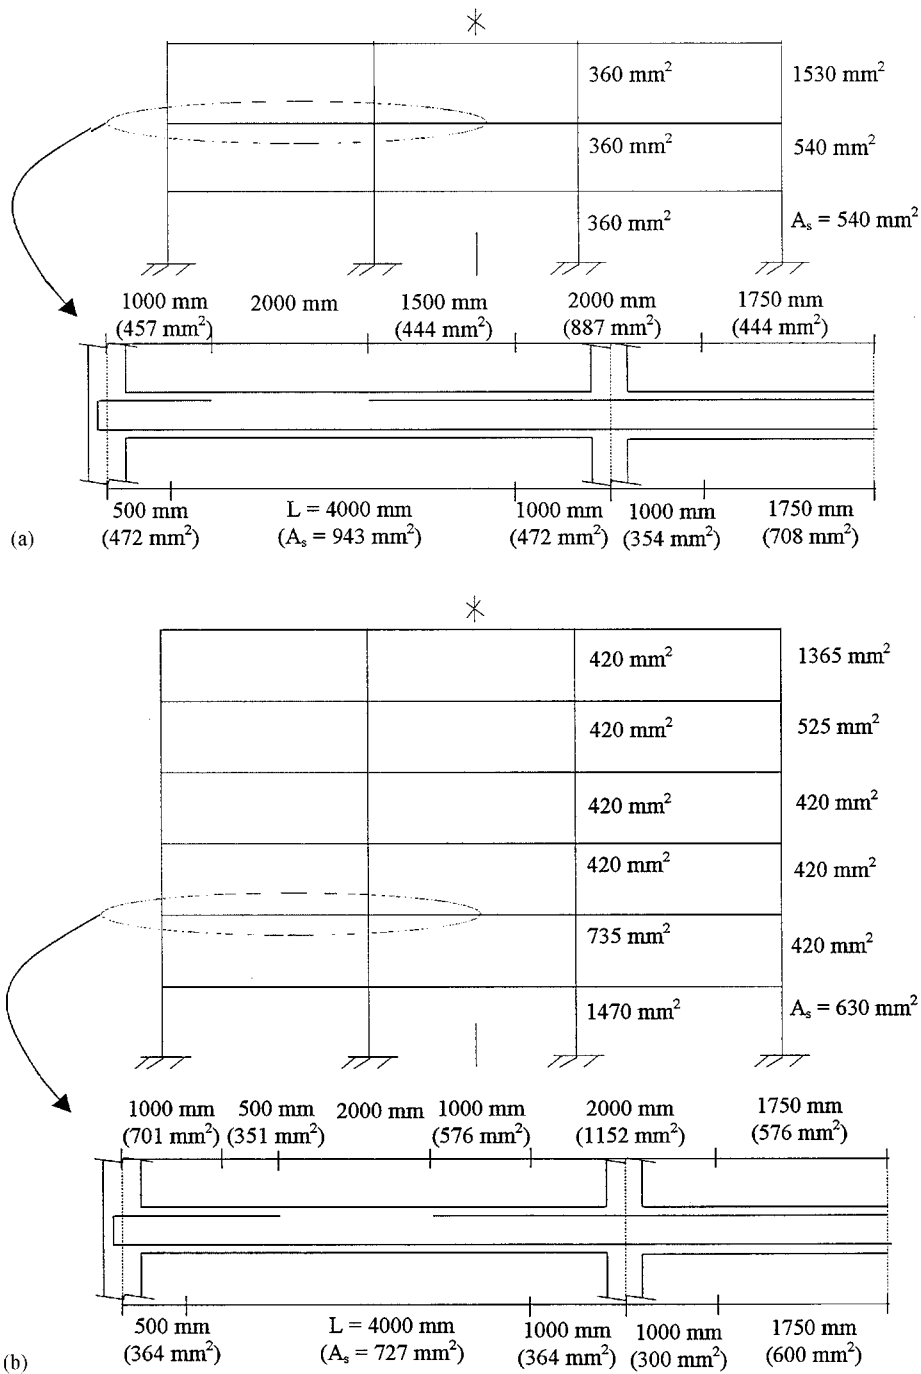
(a) Column and beam reinforcement for three-storey frame; (b) column and beam reinforcement for six-storey frame
